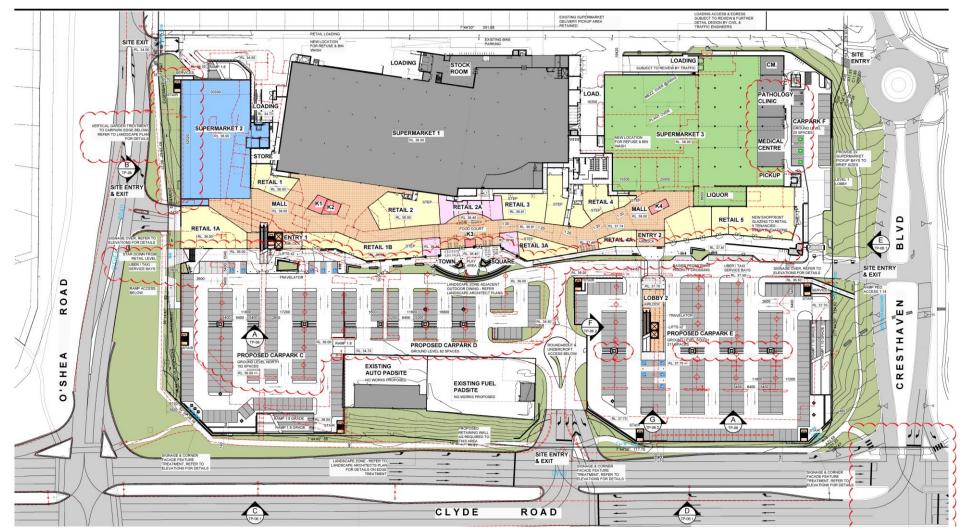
EDEN RISE VILLAGE DEVELOPMENT PLAN
